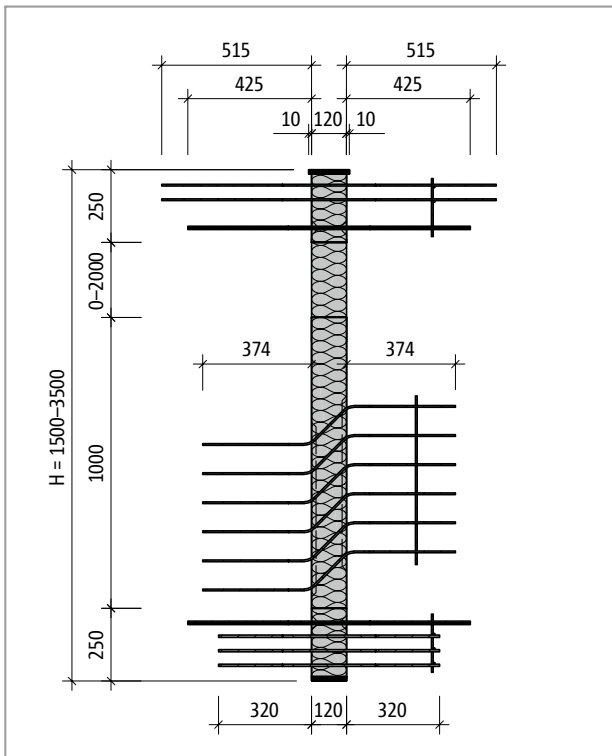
Schöck Isokorb® XT type W-M1: Product section
